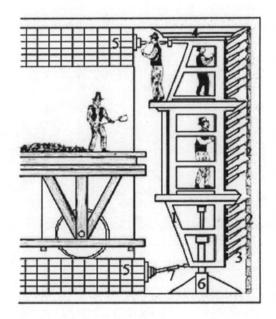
Marc Isambard Brunel's rectangular tunneling shield (Gardner, 1996)
